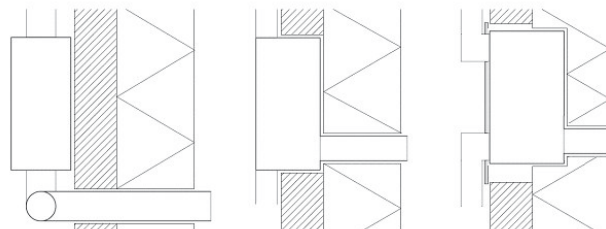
The heat recovery system can be placed at the wall (wall mounted (left)) or in the wall (wall integrated (middle and right)). This way, the outdoor air and the exhaust air duct are as short as possible (cost, energy and space saving).
